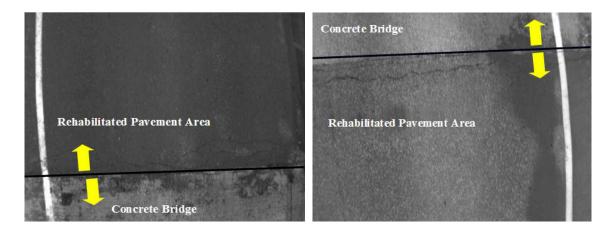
Alligator cracks at the interface between rehabilitated pavement and existing concrete bridge.
